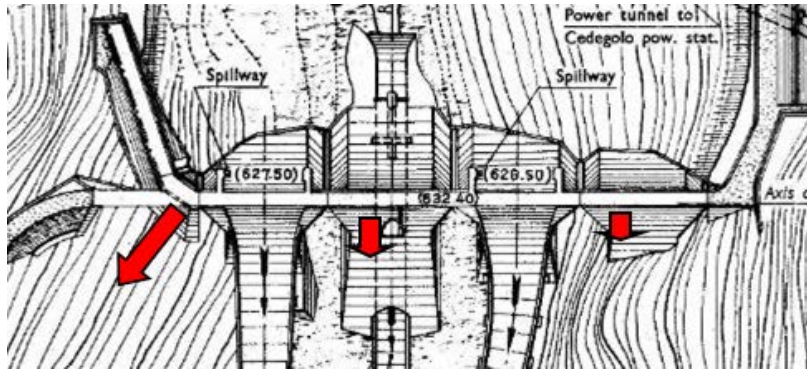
Horizontal downstream movements of different concrete blocks of a hollow gravity concrete dam.
